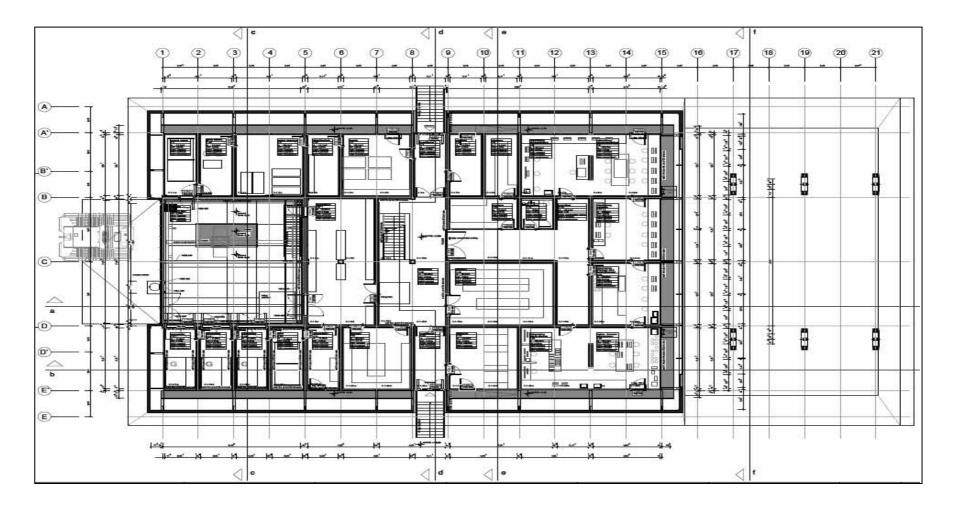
FACILITY DISTRIBUTION IN THE GROUND FLOOR
